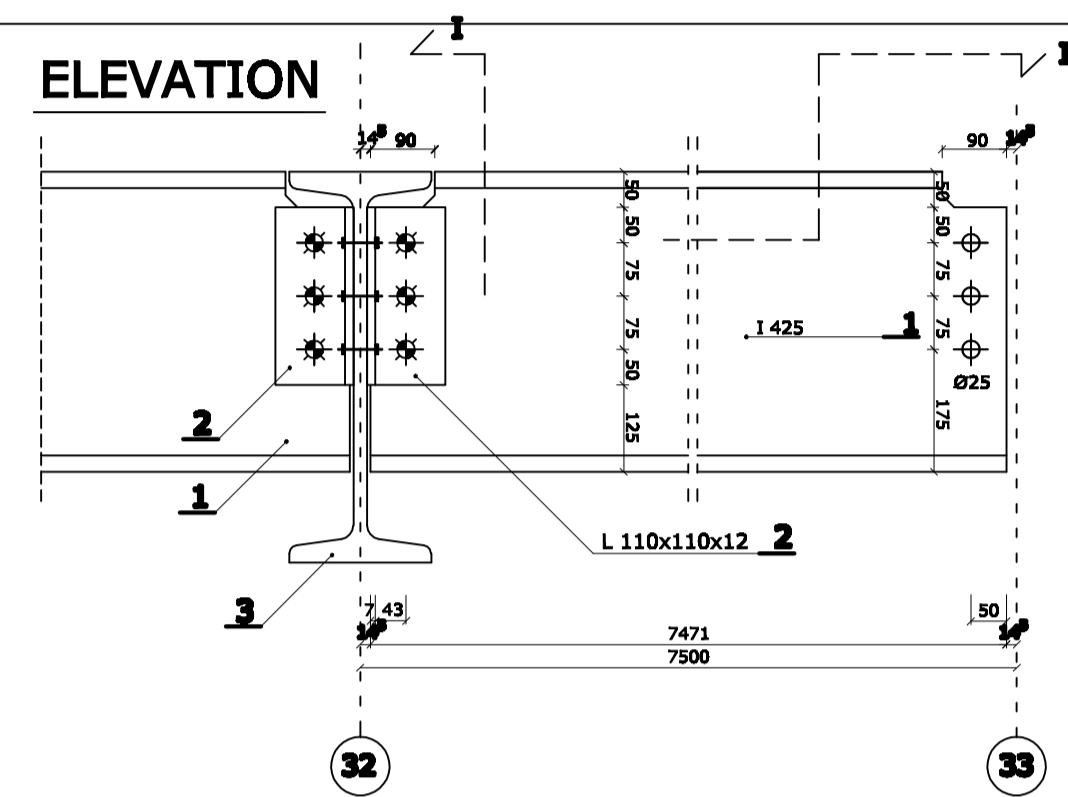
CONNECTION - PRIMARY TO SECONDARY BEAM 1:10
